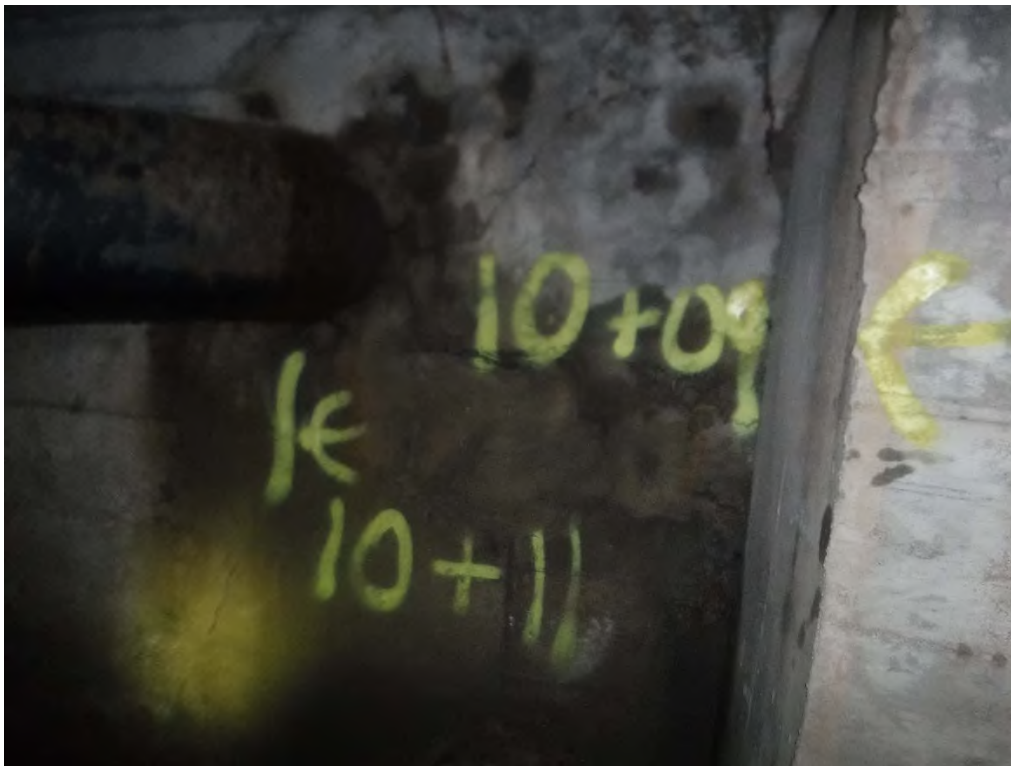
STA. 10+09, Construction joint and 12" DI Sanitary Sewer.
